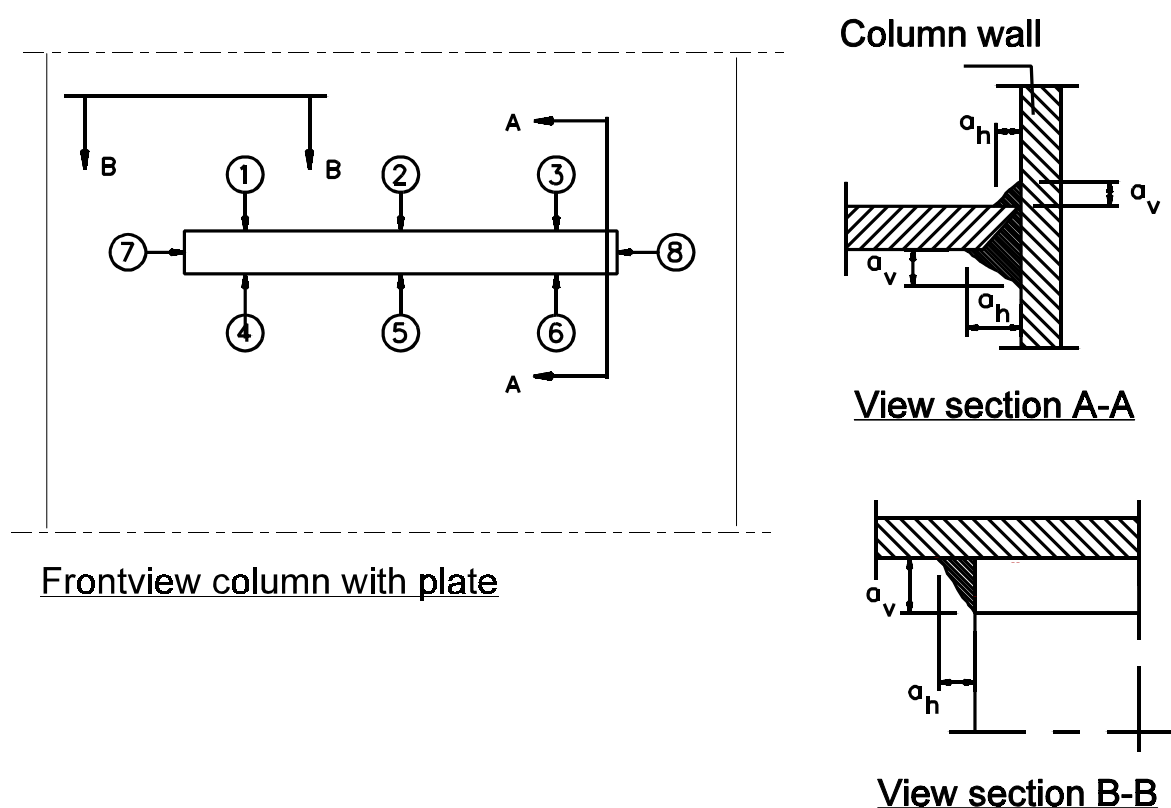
Weld measurements for test series 1 and 2
